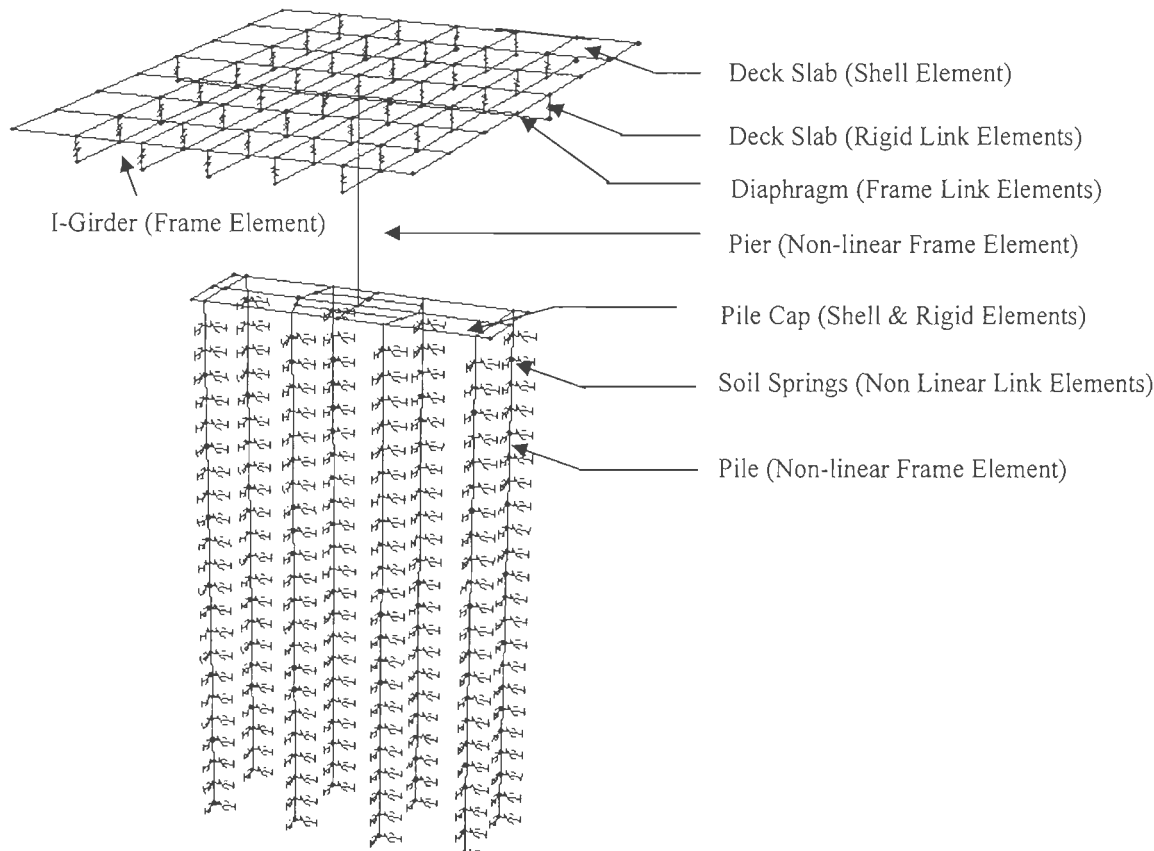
Finite element model of integral bridge representing lateral-soil-pile, pier and superstructure modelling
